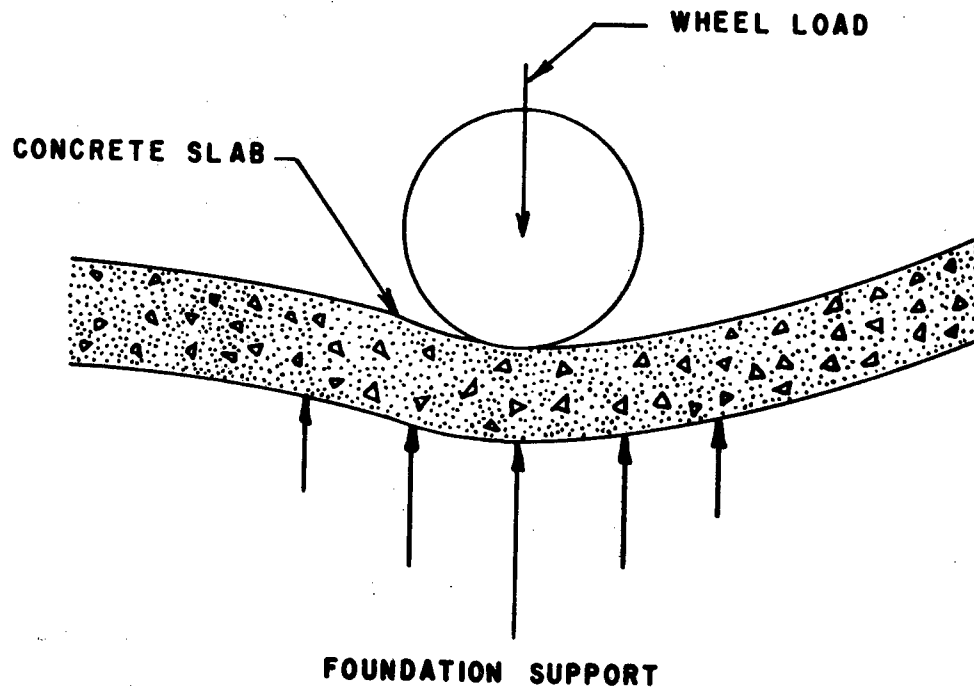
Transfer of wheel load to foundation in rigid pavement structure.
